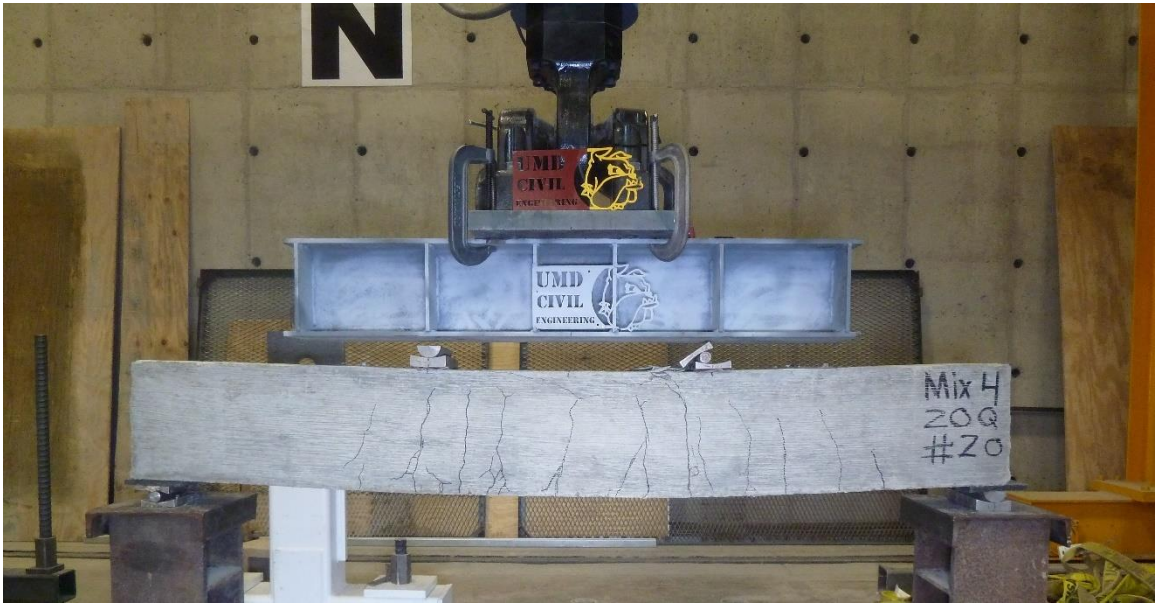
Mixture 4 (20Q) beam #20: concrete beam after testing.
